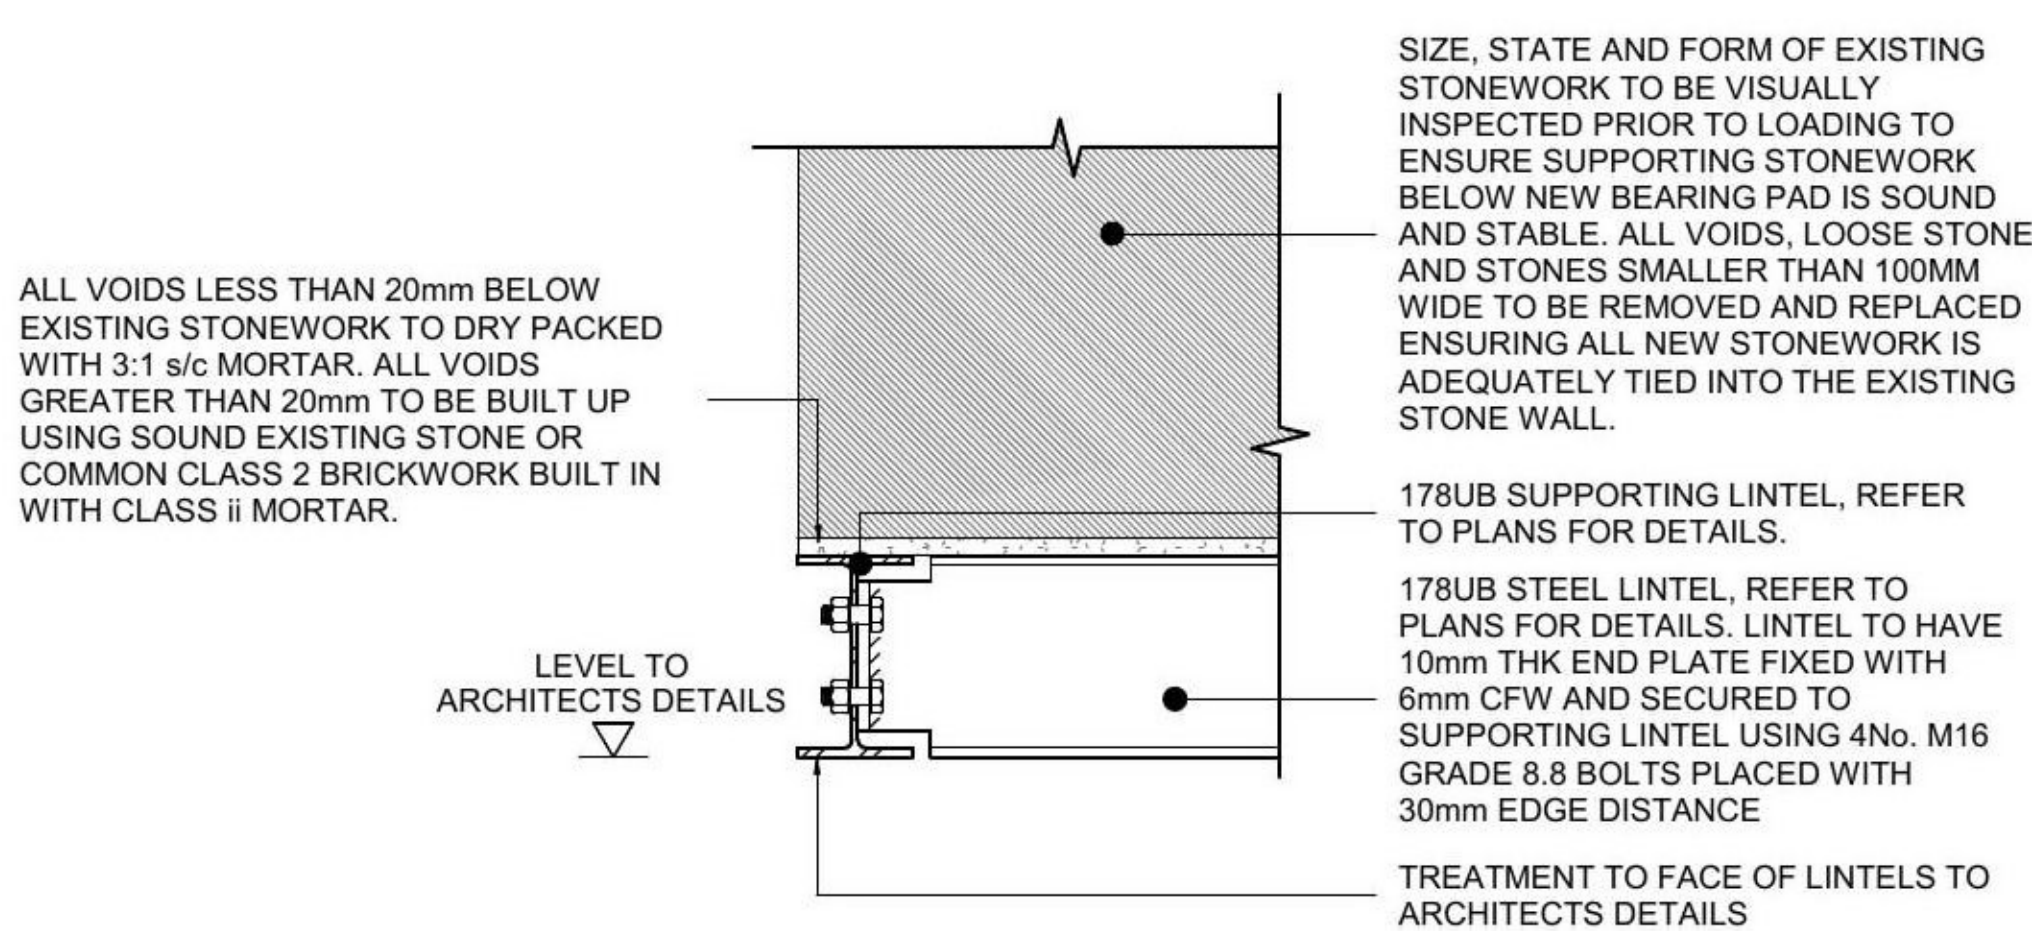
STEEL LINTELS BEARING ON STONE WALL (IN PLANE)
